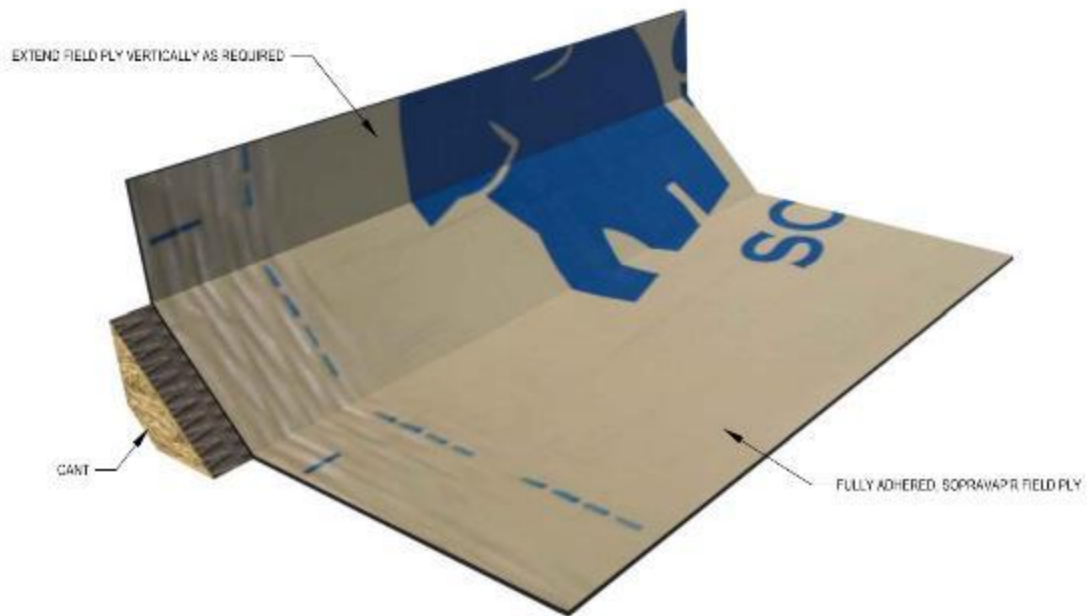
Fully Adhered, Self-Adhesive SOPRAVAP'R Termination at Wall/Curb With Cant
